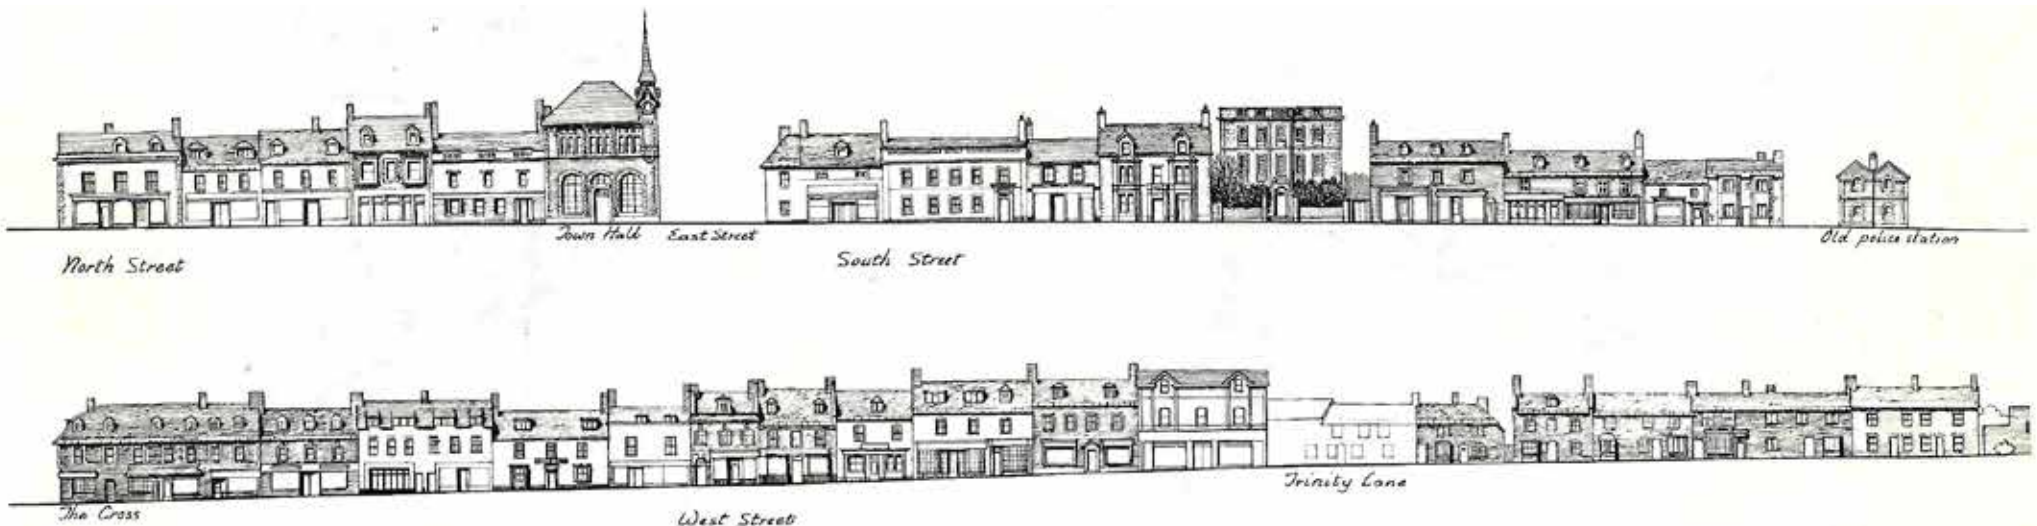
Wareham Street Elevations (Wareham Conservation Study, DCC, 1969)
